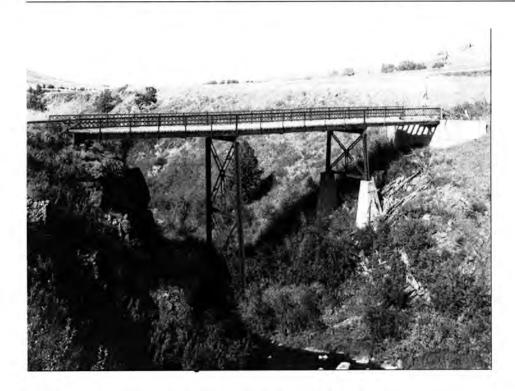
Shonkin Creek Bridge. South elevation. View to the north
